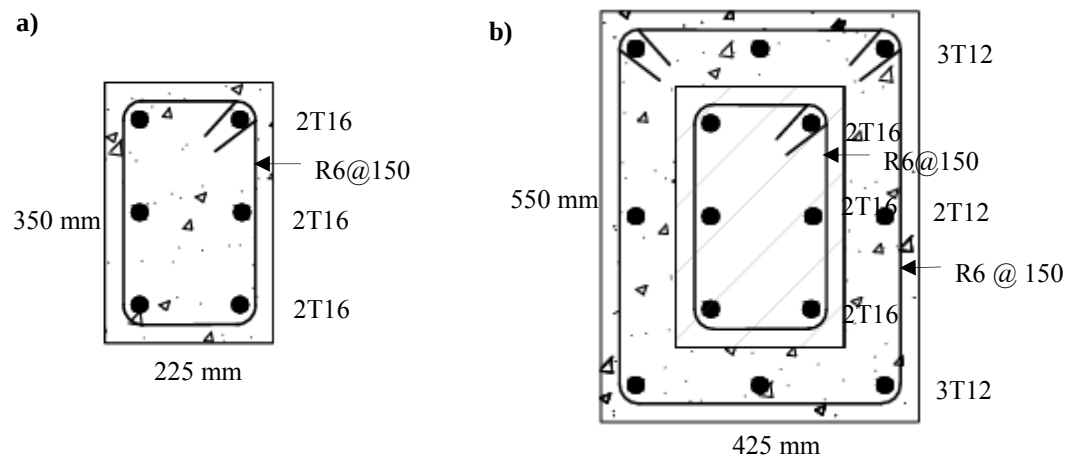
Section sizes and reinforcement details (a) defective column, (b) retrofitted column
